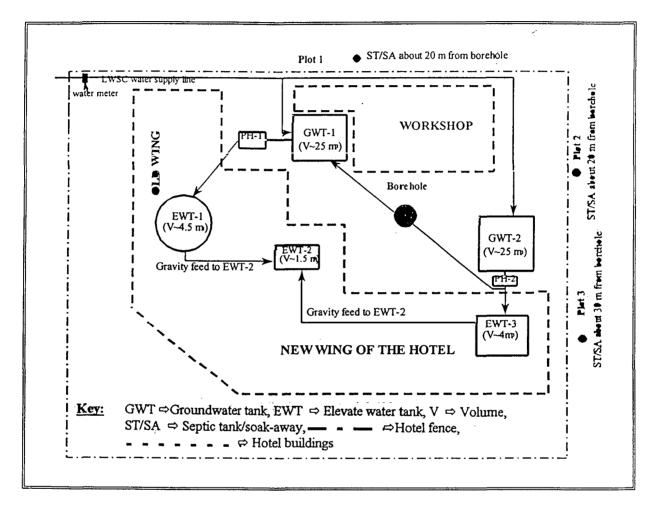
Schematic layout of the water distribution system at Fairview (not to scale)
